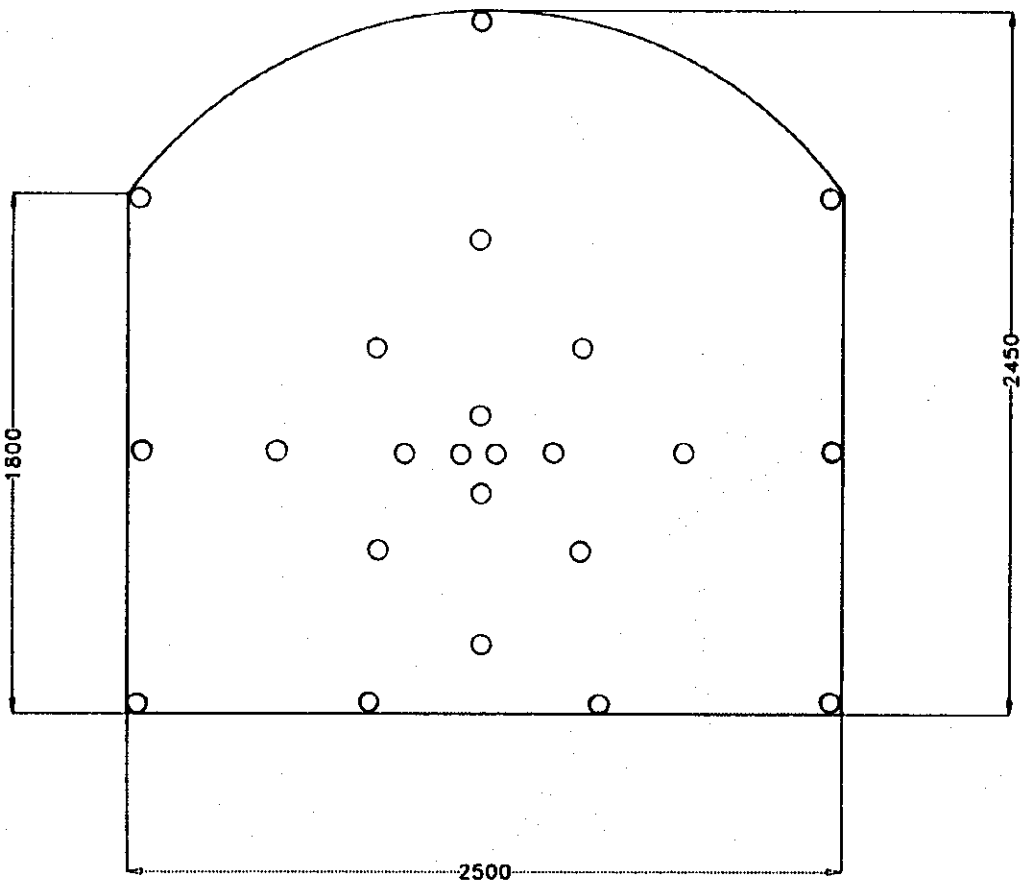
Drilling Pattern of the Tunnel (unit : mm)
